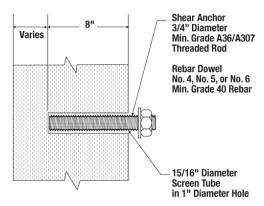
CONFIGURATION A (SHEAR ANCHOR OR REBAR DOWEL)1
